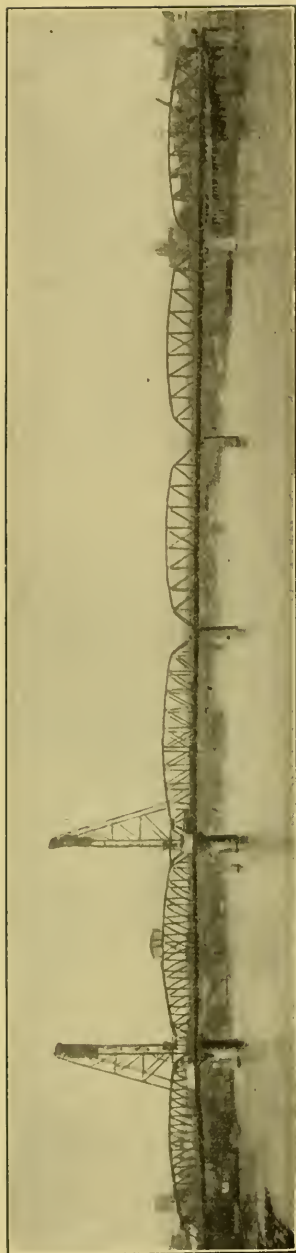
Hawthorne Avenue Bridge over the Willamette River at Portland, Ore.—Lifting Span Down.
